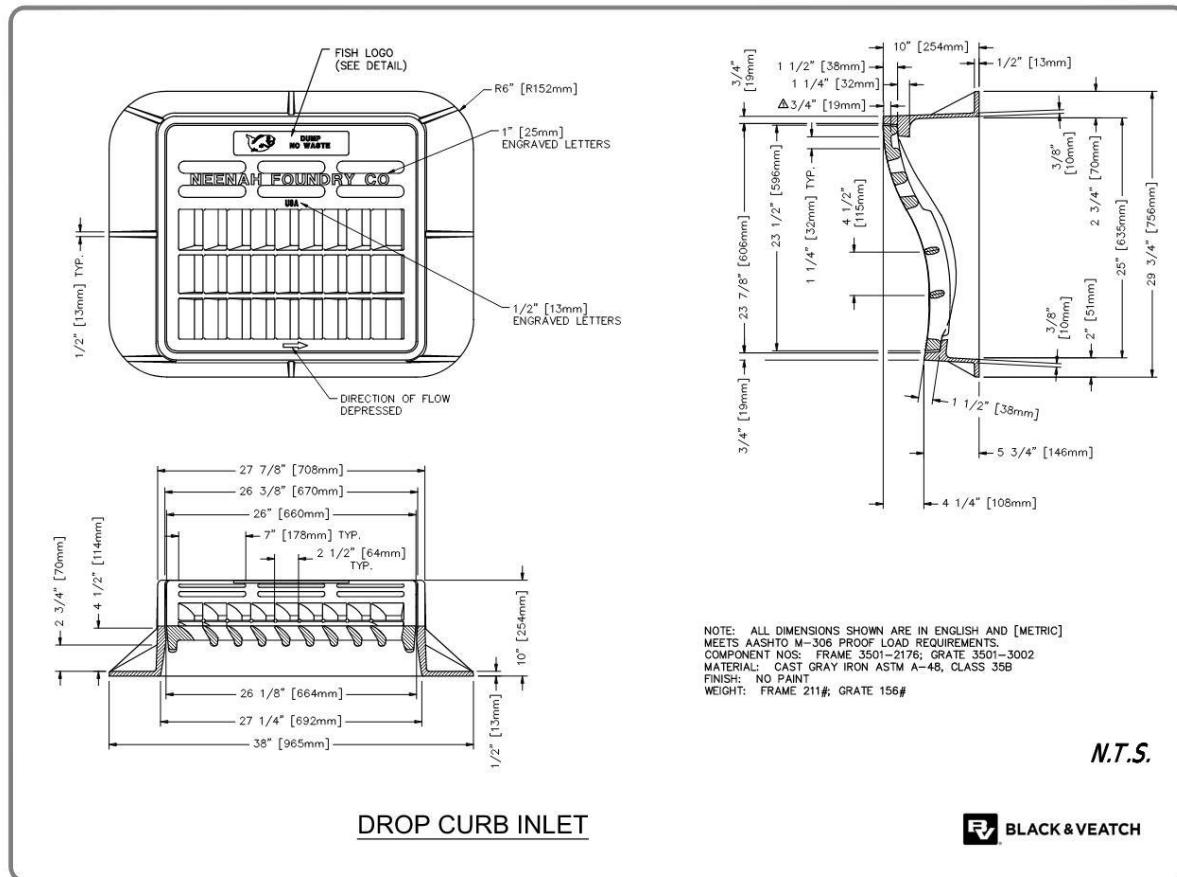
Standard Detail Depicting a Drop Curb Inlet
